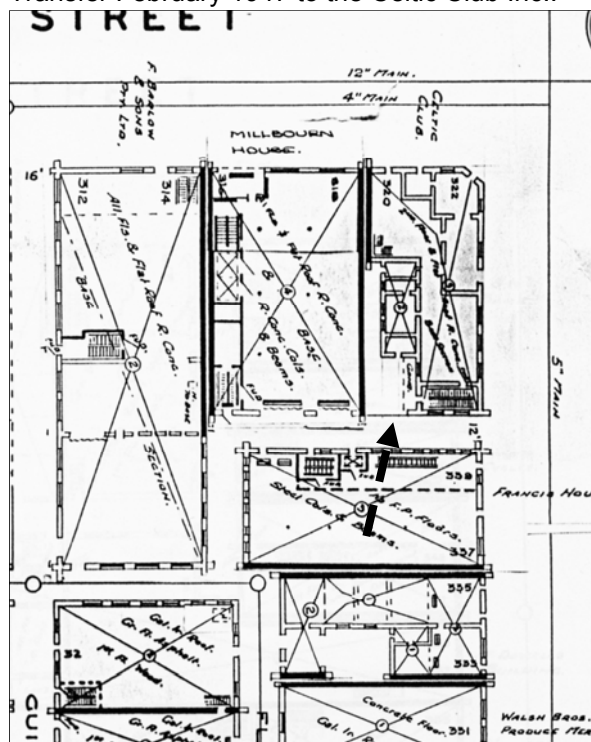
Mahlstedt's Fire Insurance Plans Melbourne: shows reinforced concrete floors and roof
